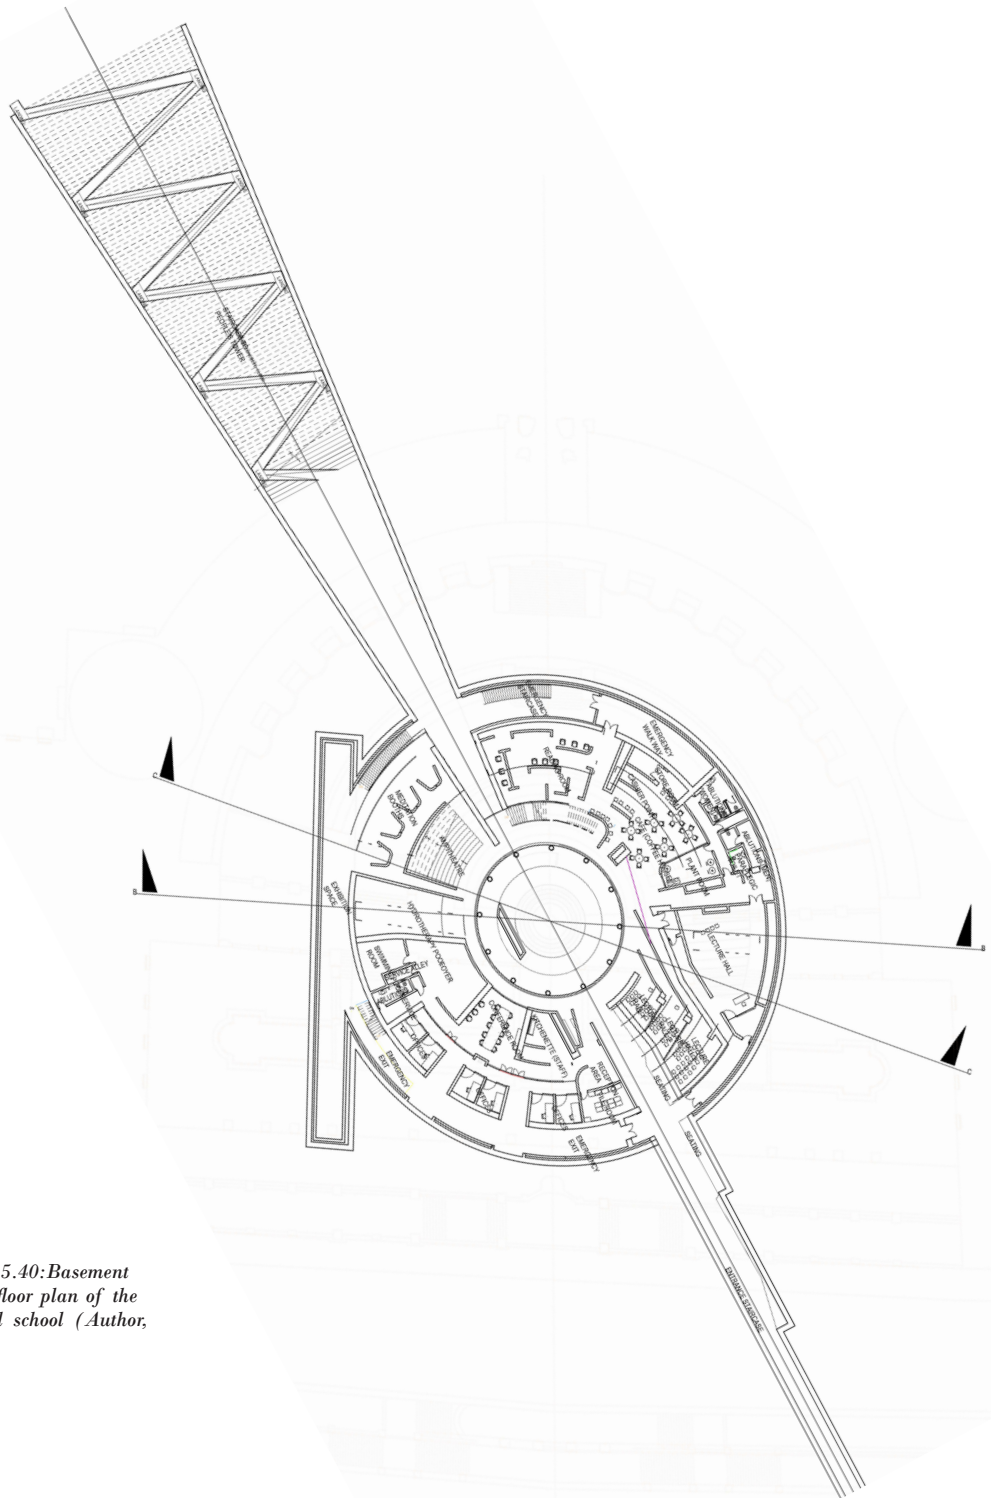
Basement second floor plan of the political school (Author, 2015)
